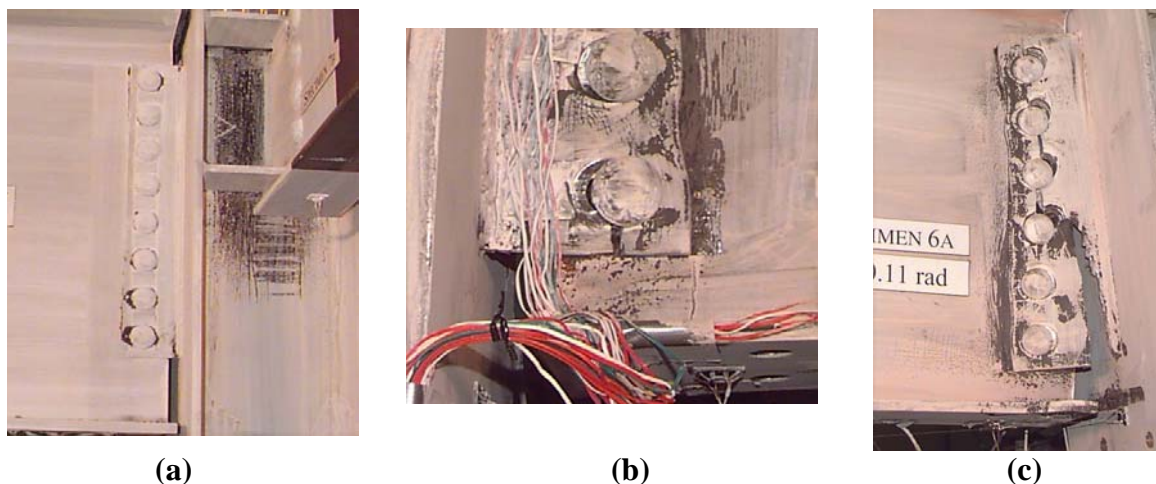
Illustrations for damage states of shear tab connections (a) DS-1, (b) DS-2, (c) DS-3.
